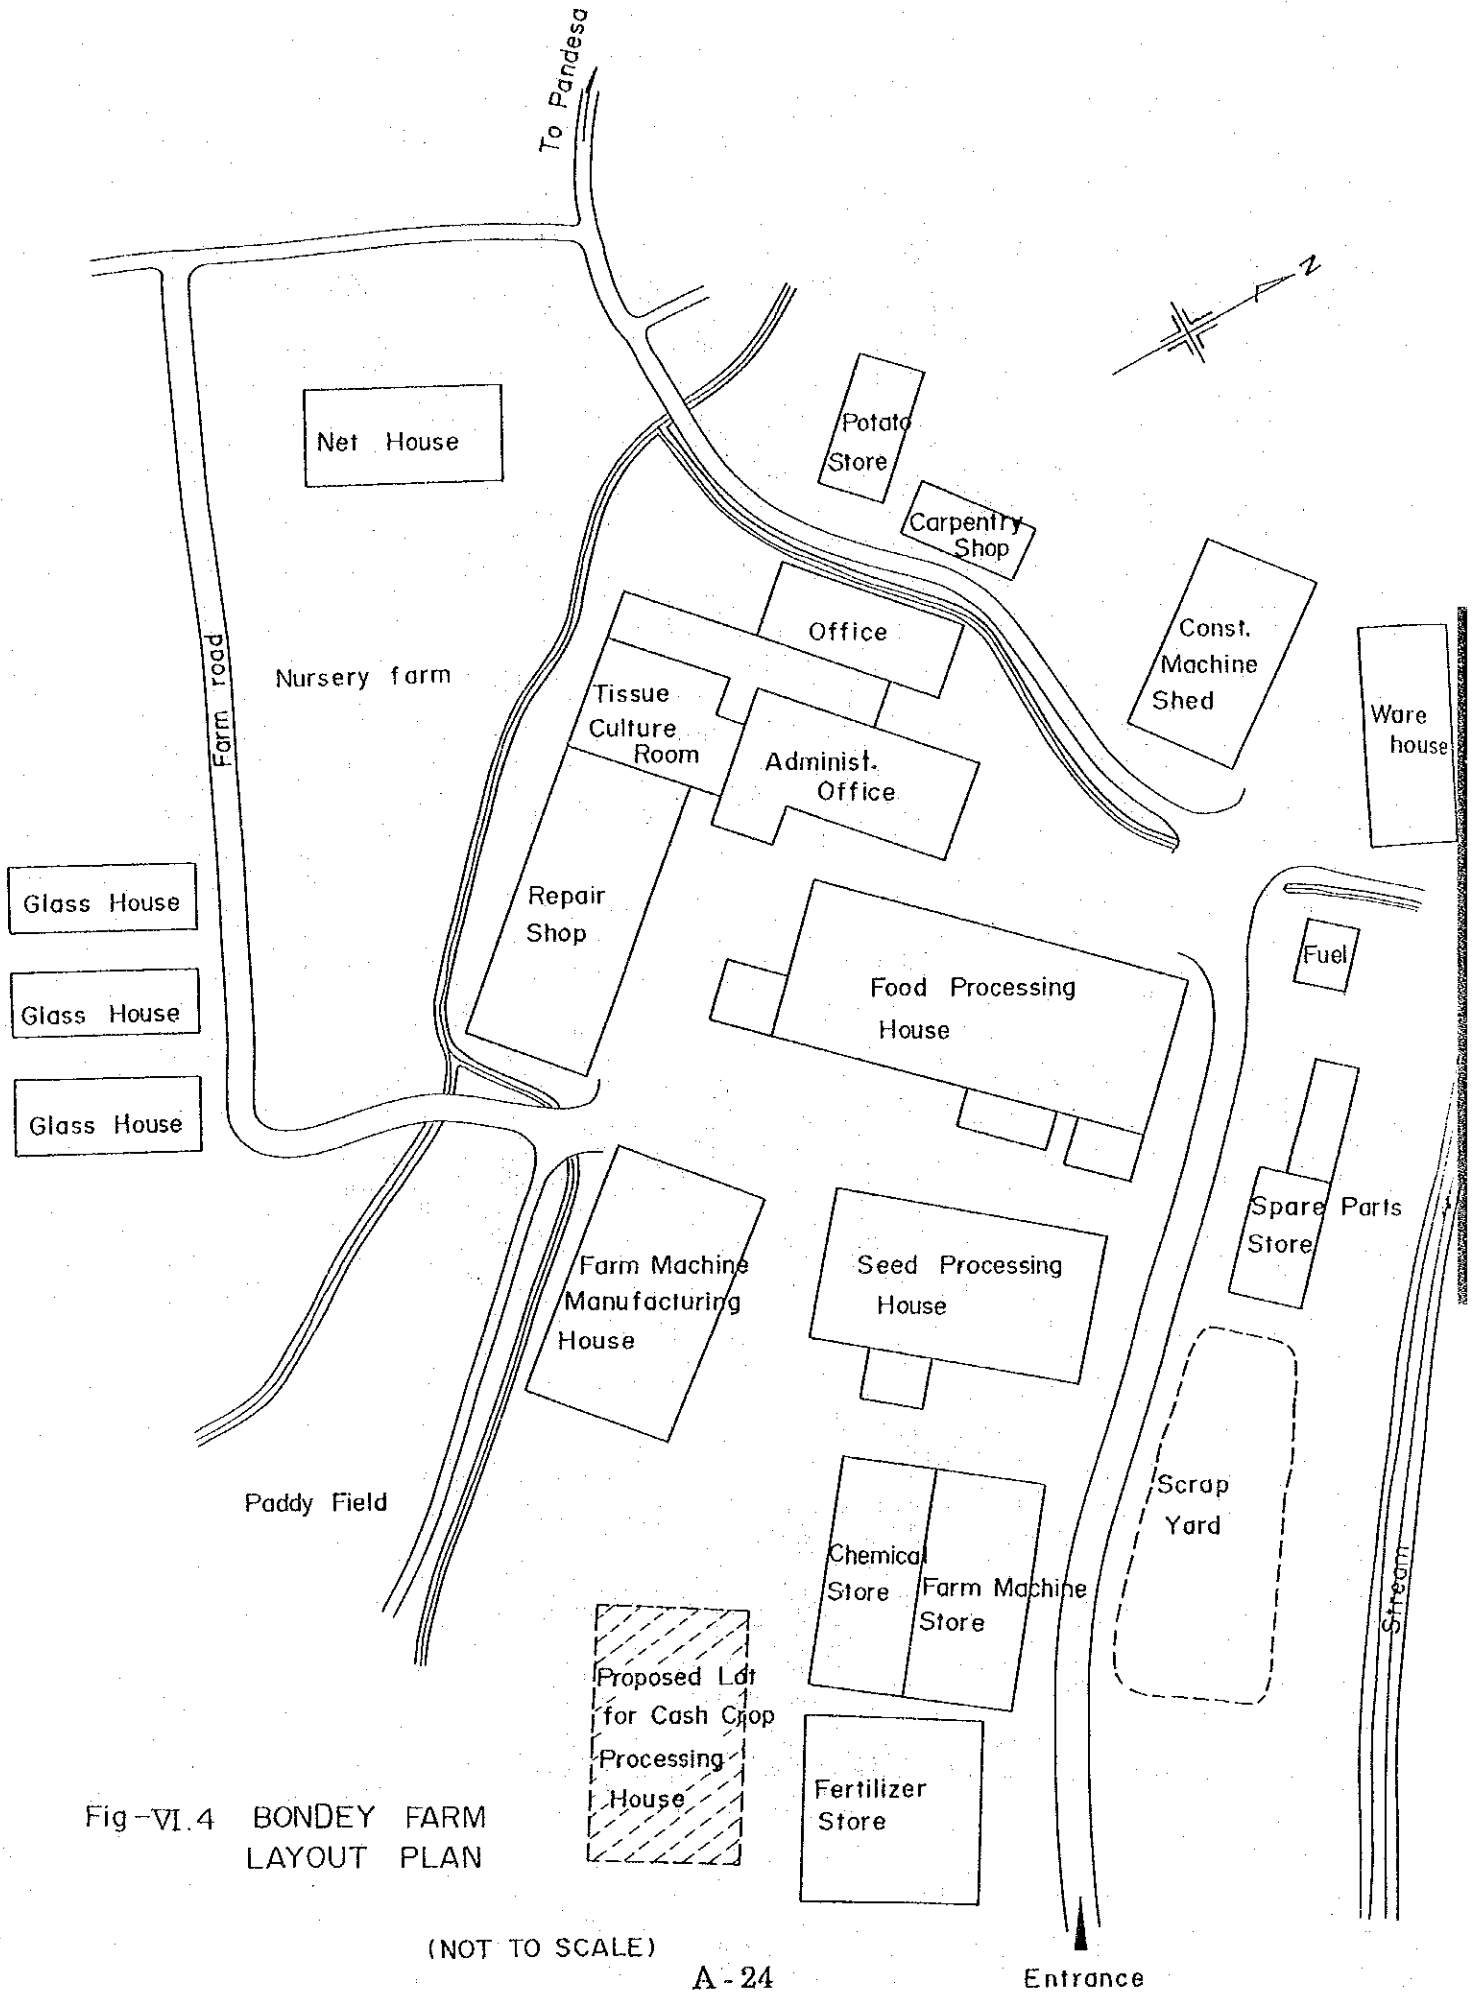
BONDEY FARM LAYOUT PLAN
